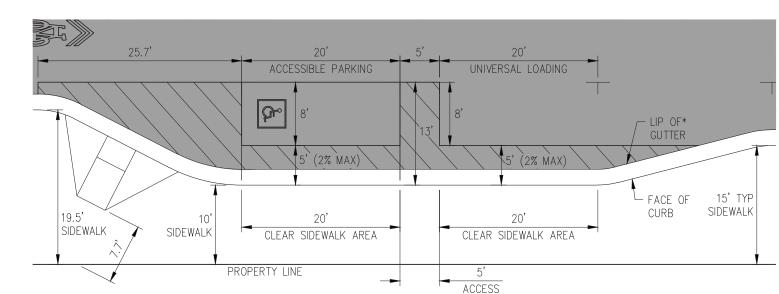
Universal Passenger Loading Zone and Accessible Parking Stall
